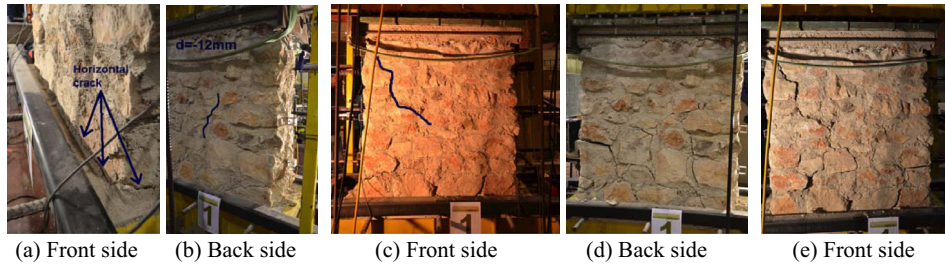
Specimen S1. First visible crack (a–c). Collapse mechanism (d and e).
